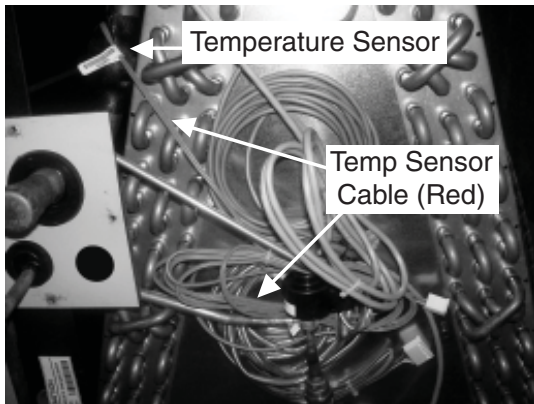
Suction Line Temperature Sensor and 2-Wire cable in iQ Drive Coil Assembly 919230E
